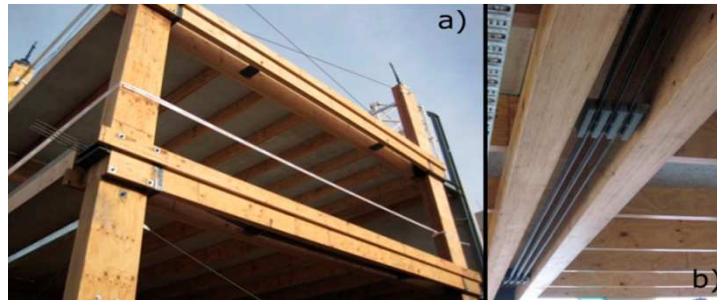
lateral view of the post-tensioned frame (left) and draped tendon detailing (right) of the Massey University in Wellington (189)
